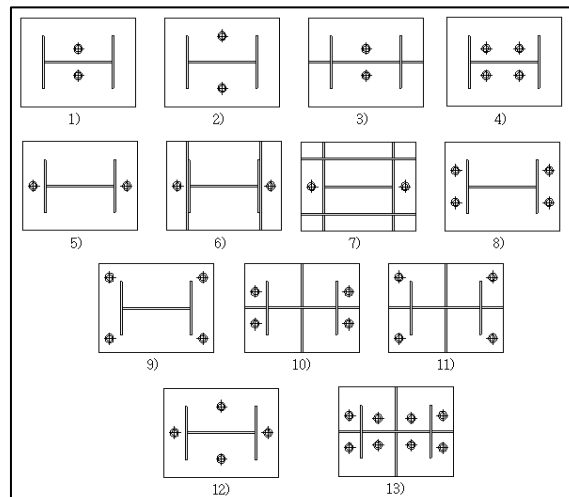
arrangement method of anchor bolts in the steel exposed column base
